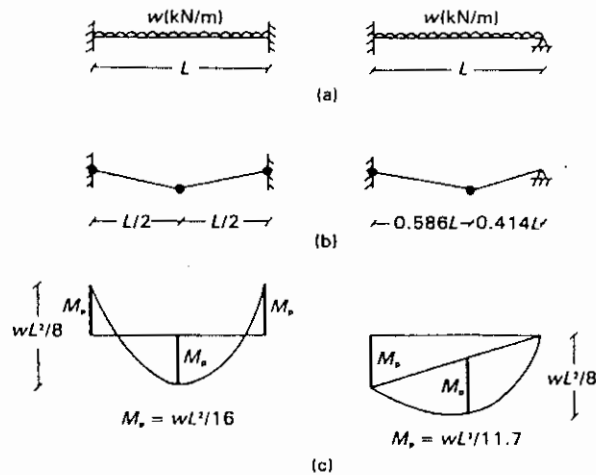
Plastic collapse of internal and end spans of continuous beams: (a) support arrangements; (b) plastic collapse mechanisms; (c) bending moments at collapse.
